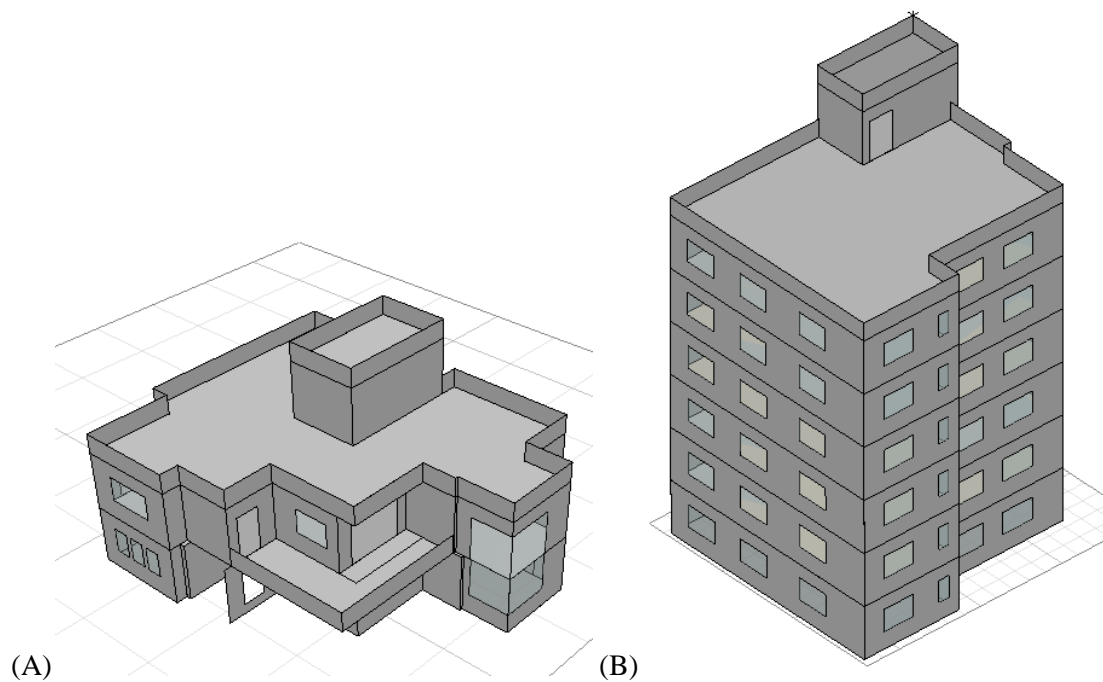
Images of building used in the simulation (A) individual house (villa) (B) multi storey building
